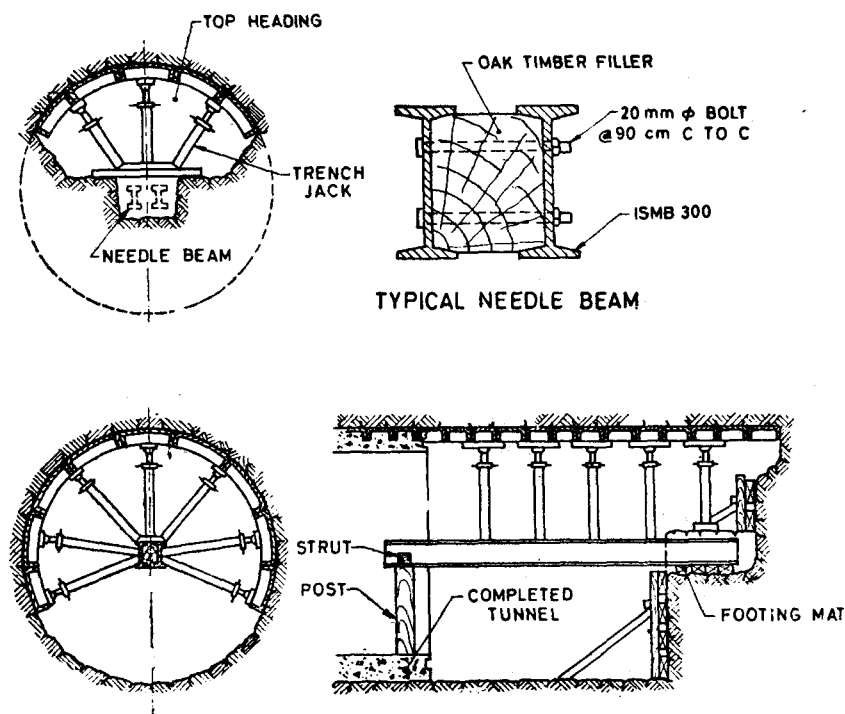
NEEDLE-BEAM METHOD OF TUNNELLING WITH STEEL LINER PLATES
